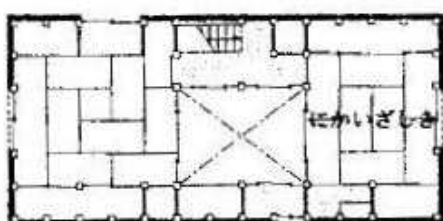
Plan of machiya 1st floor based on 3 'ken' module (Prof. Kudo)
